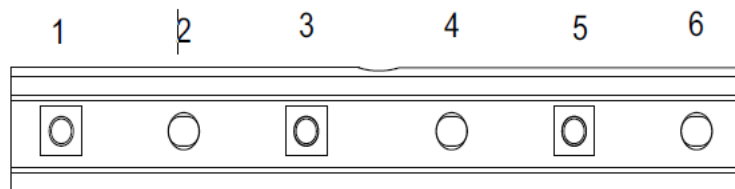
Figure SUB-PART D – 54 – Example of 6-Hole Joint Bar Bolted
